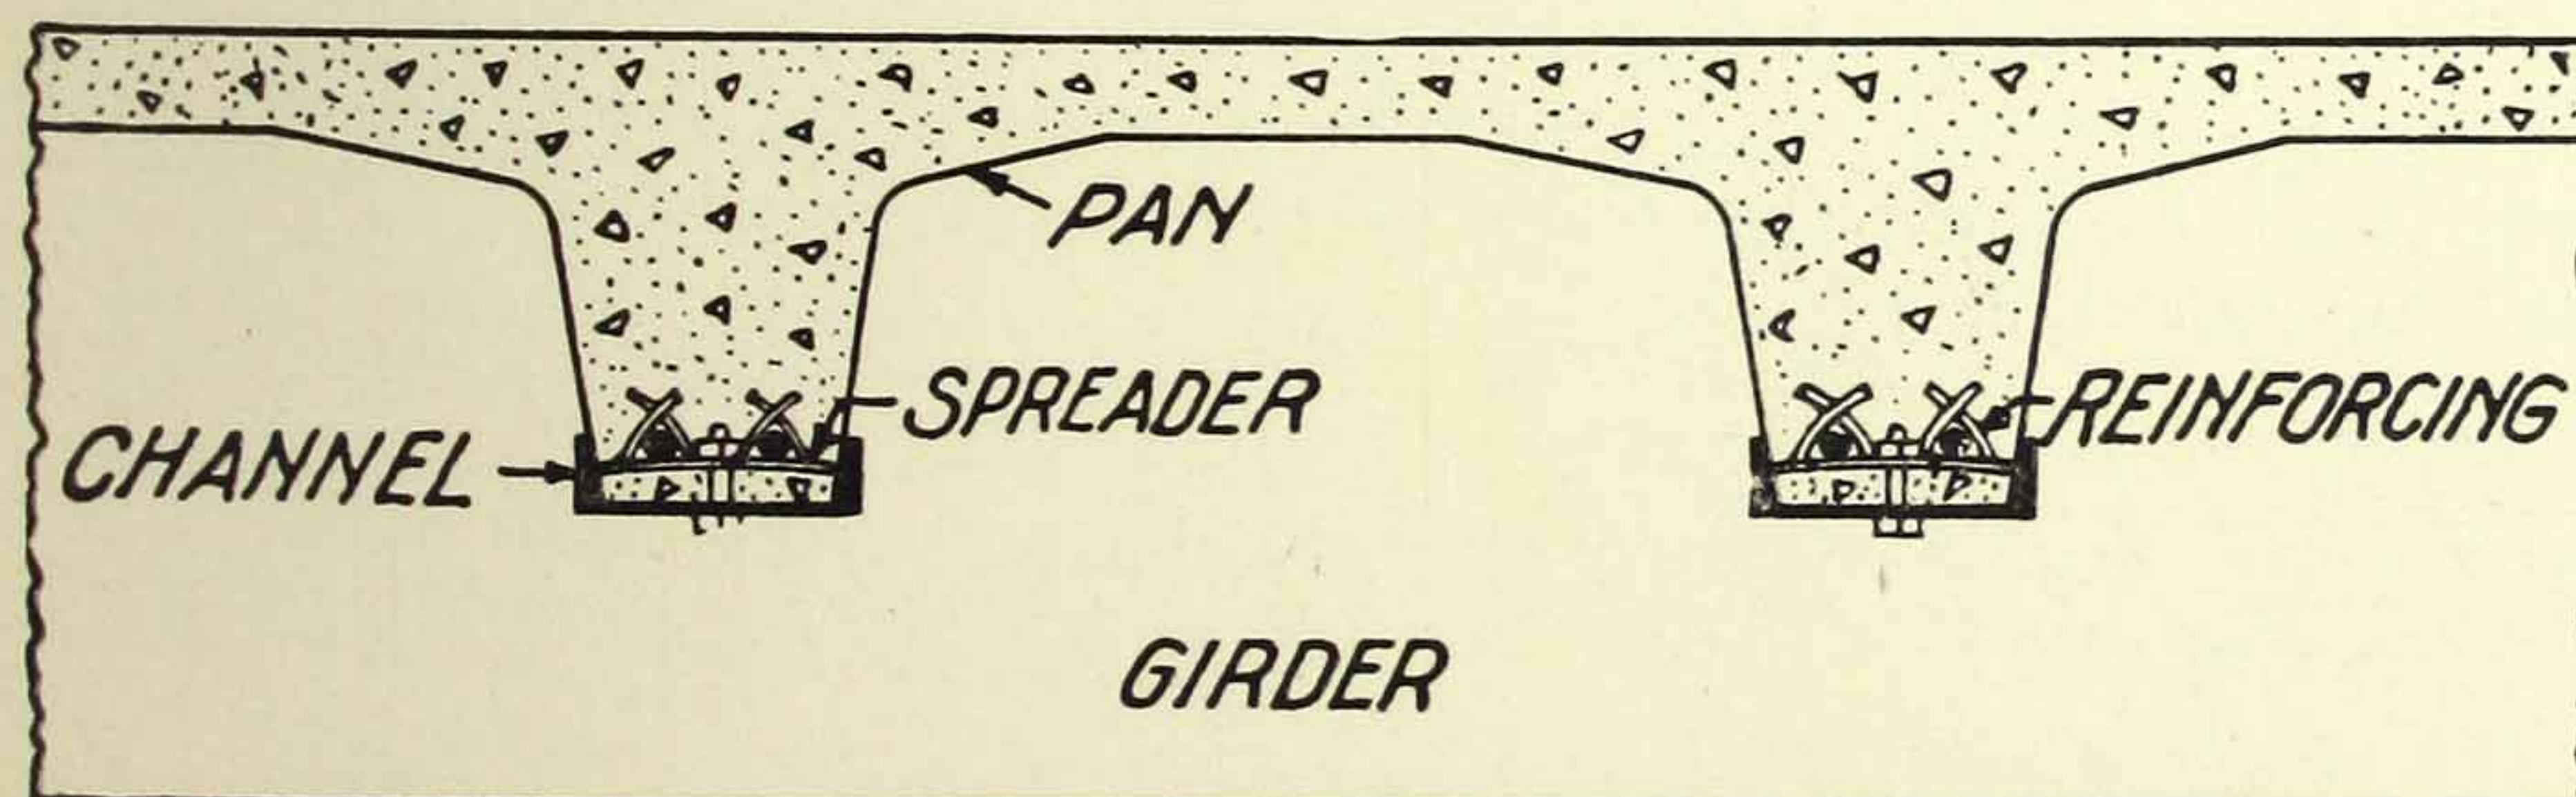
BLAWFORMS FOR BEAM AND JOIST CONSTRUCTION
